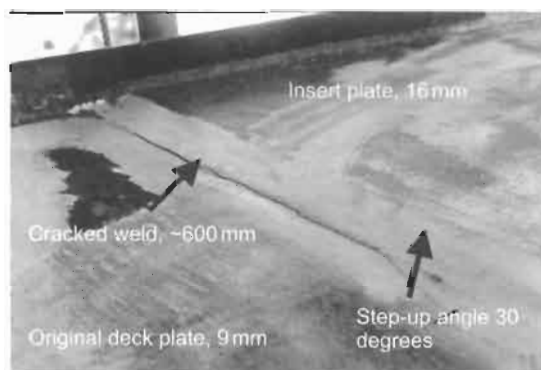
Welded connection between 9 and 16 mm plate insert (Note the length of crack).
